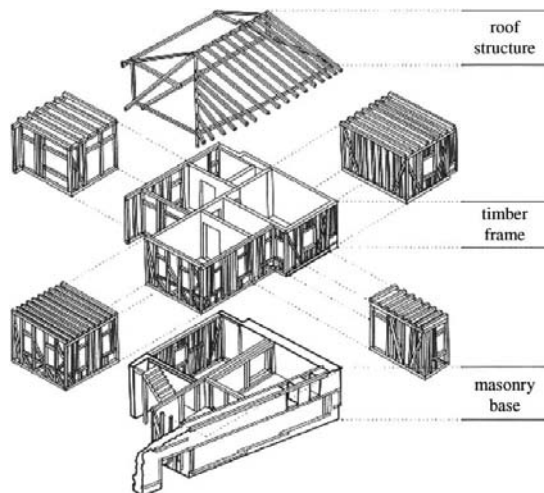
Construction System of Timber Houses [4, pp. 849]
